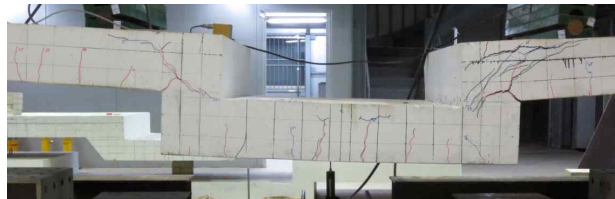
Cracking of specimen-8 by loading stage
